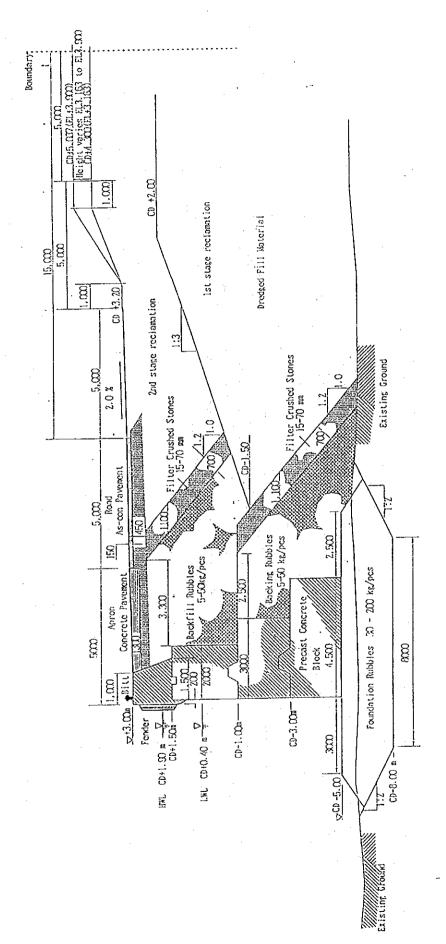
Typical Cross Section of Small Boat Basin
